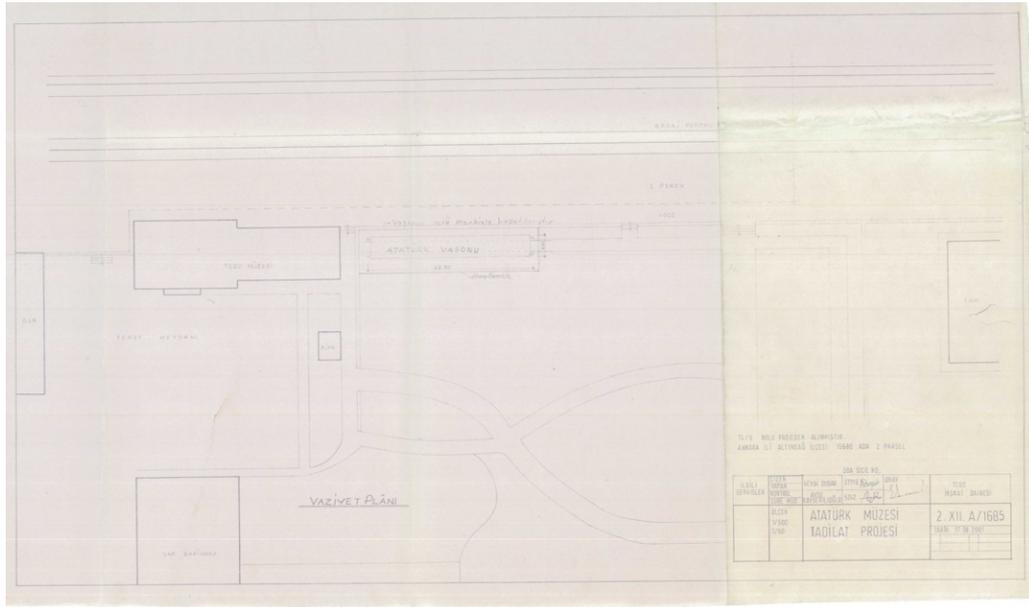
Site plan depicting the Atatürk House and Railway Museum, and the coach exhibited next to it. (Source: Şule Sezginalp Personal Archive)
